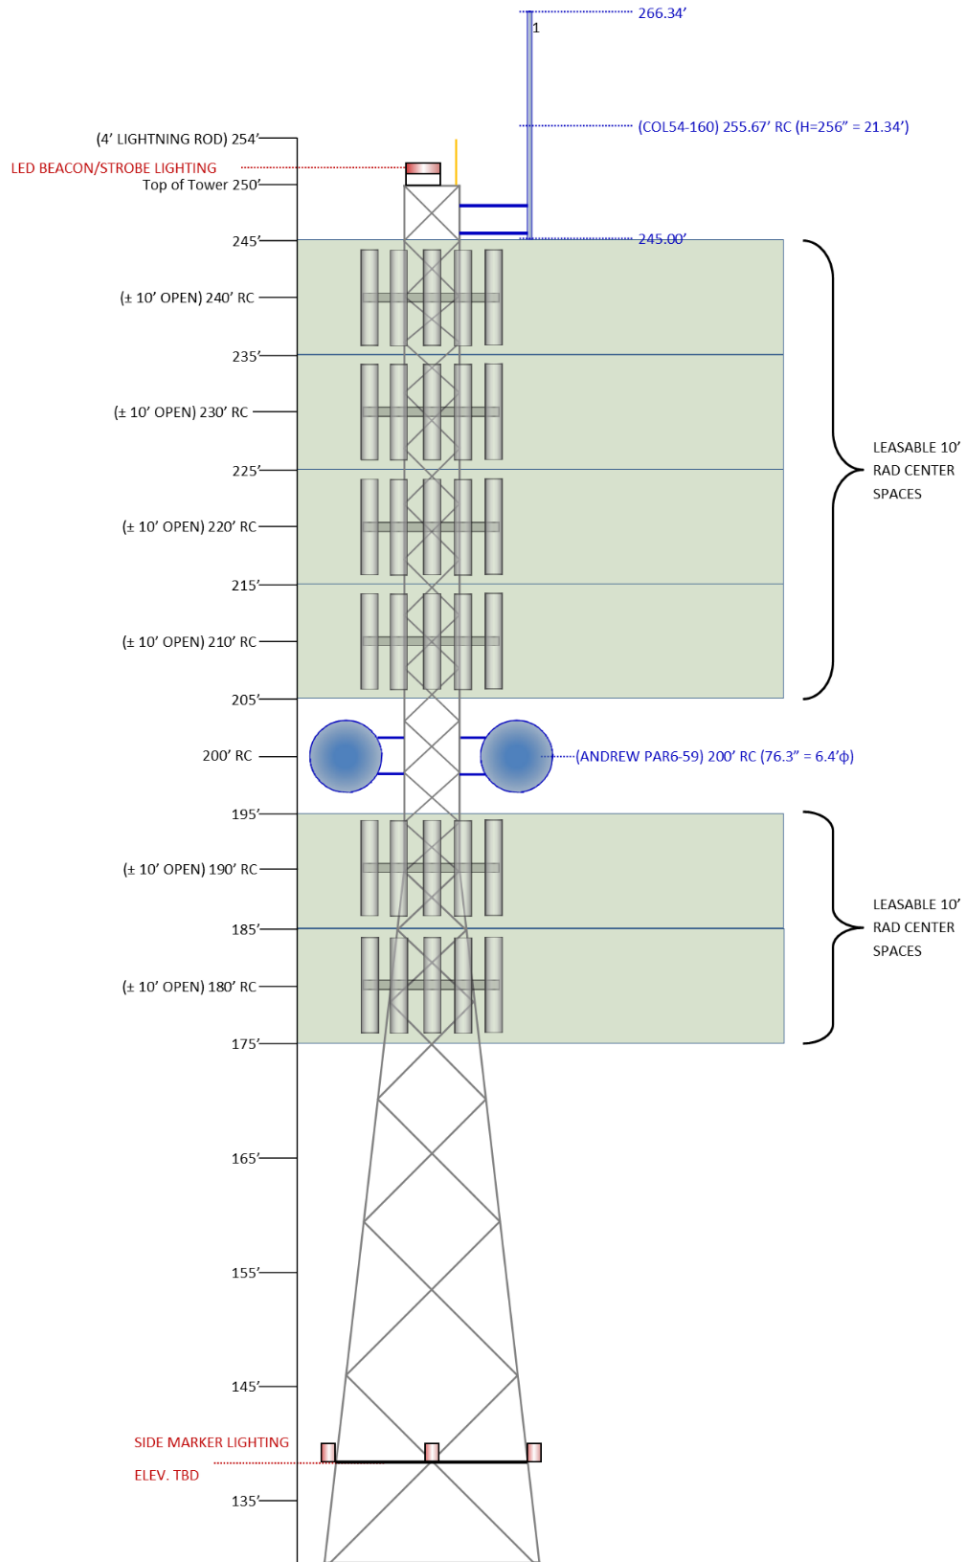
TOWER ELEVATION DIAGRAM 12-14-2016
